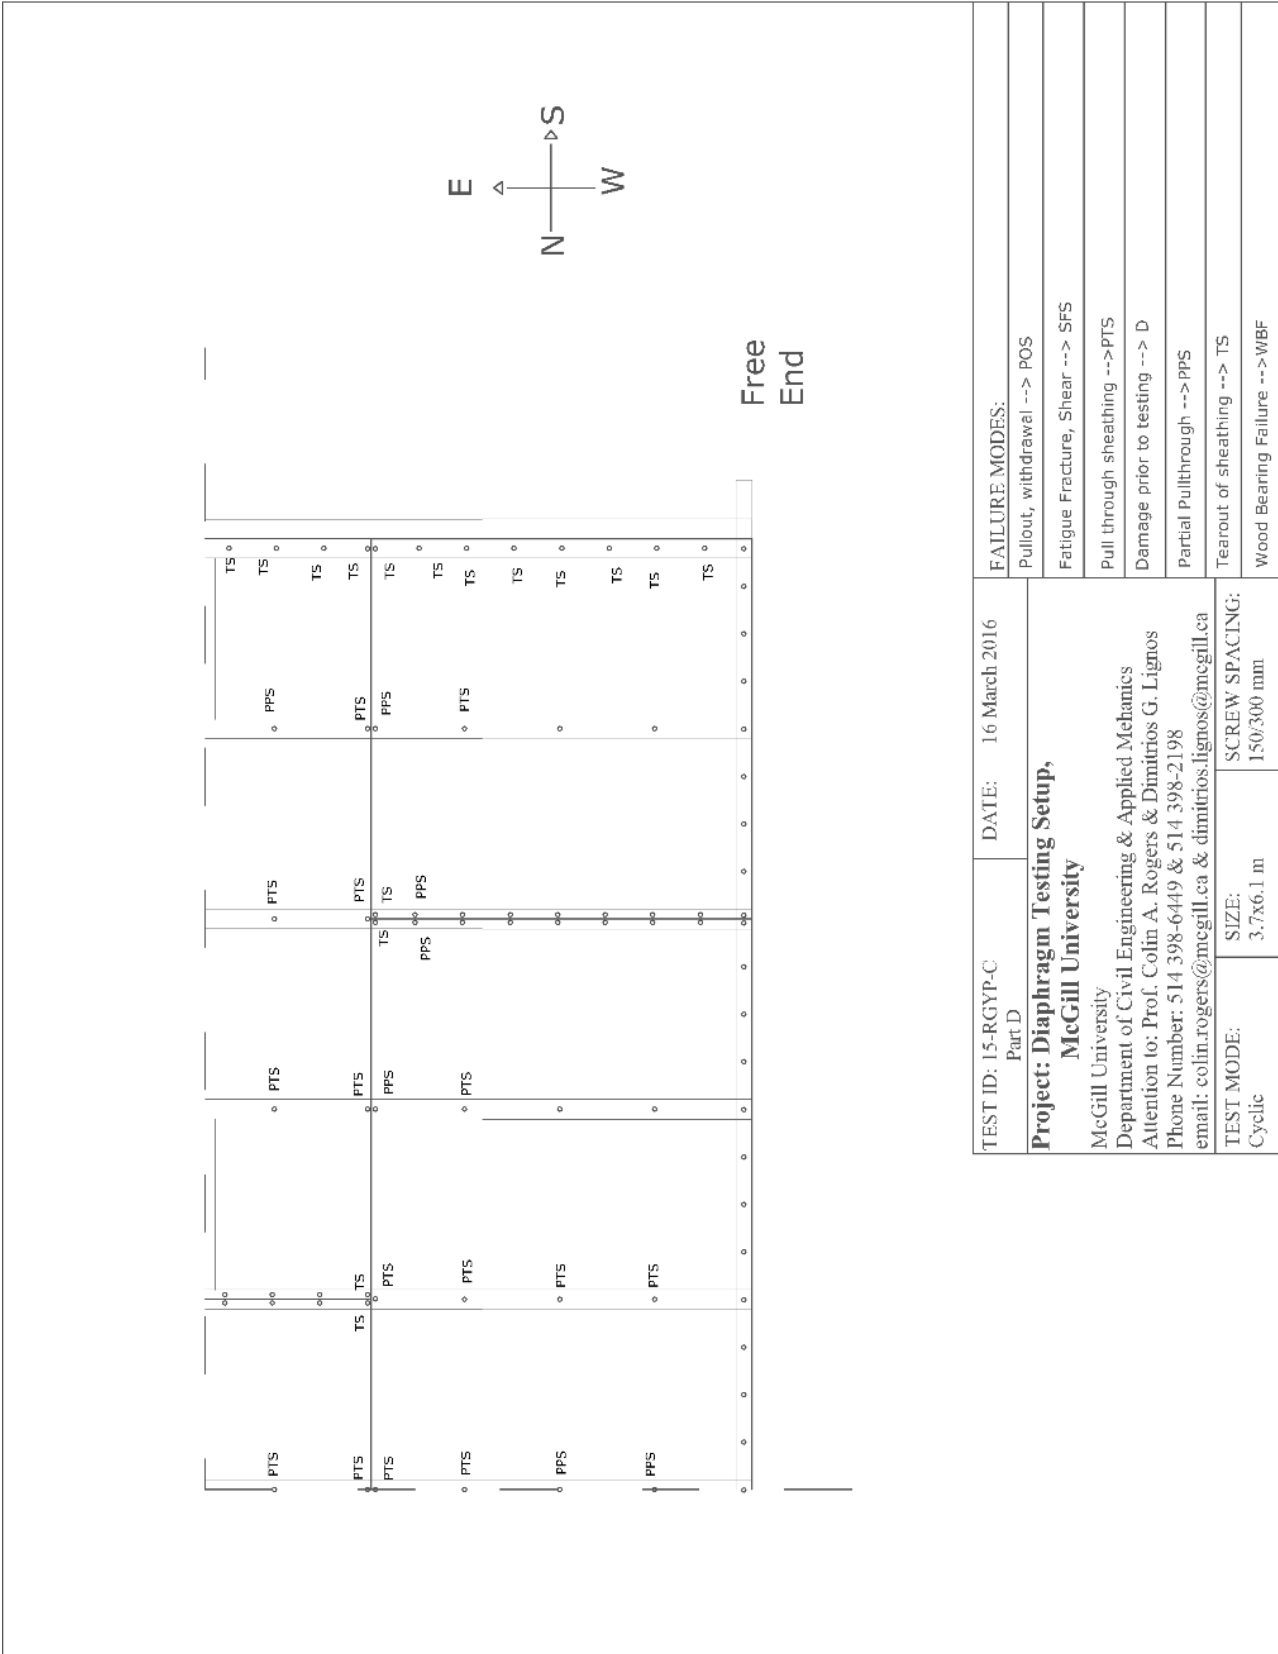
Sheathing Fastener Failure Modes Part D Specimen 15-RGYP-C
